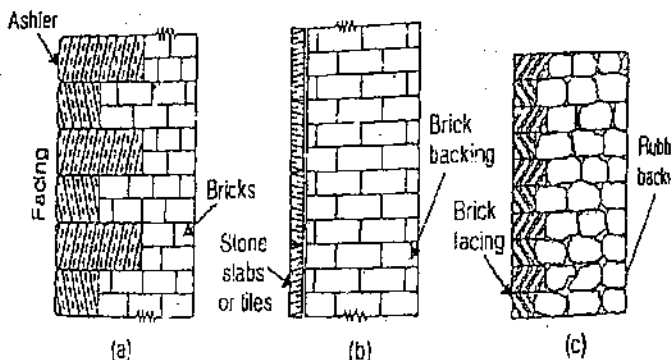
BRICK-STONE COMPOSITE MASONRY.
